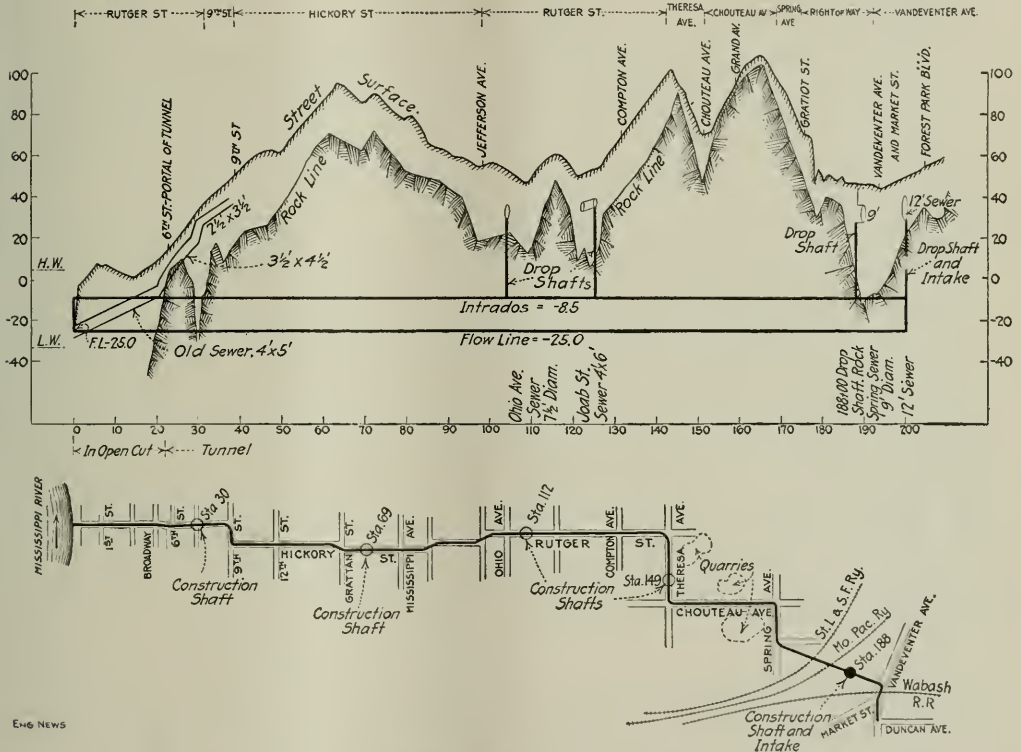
PLAN AND PROFILE OF THE NEW MILL CREEK JOINT DISTRICT SEWER, ST. LOUIS, MO.
